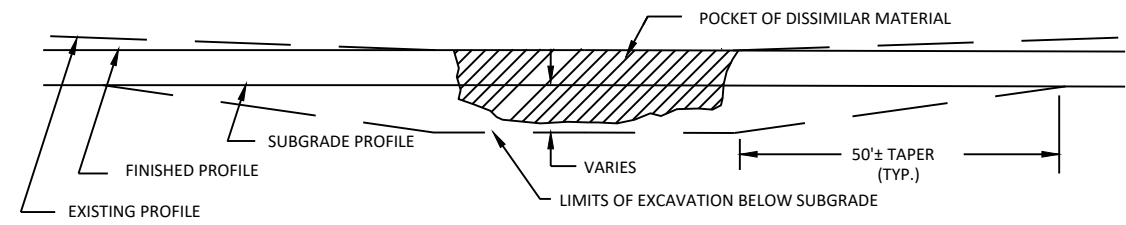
DETAIL FOR EXCAVATION BELOW SUBGRADE AT CUTS
